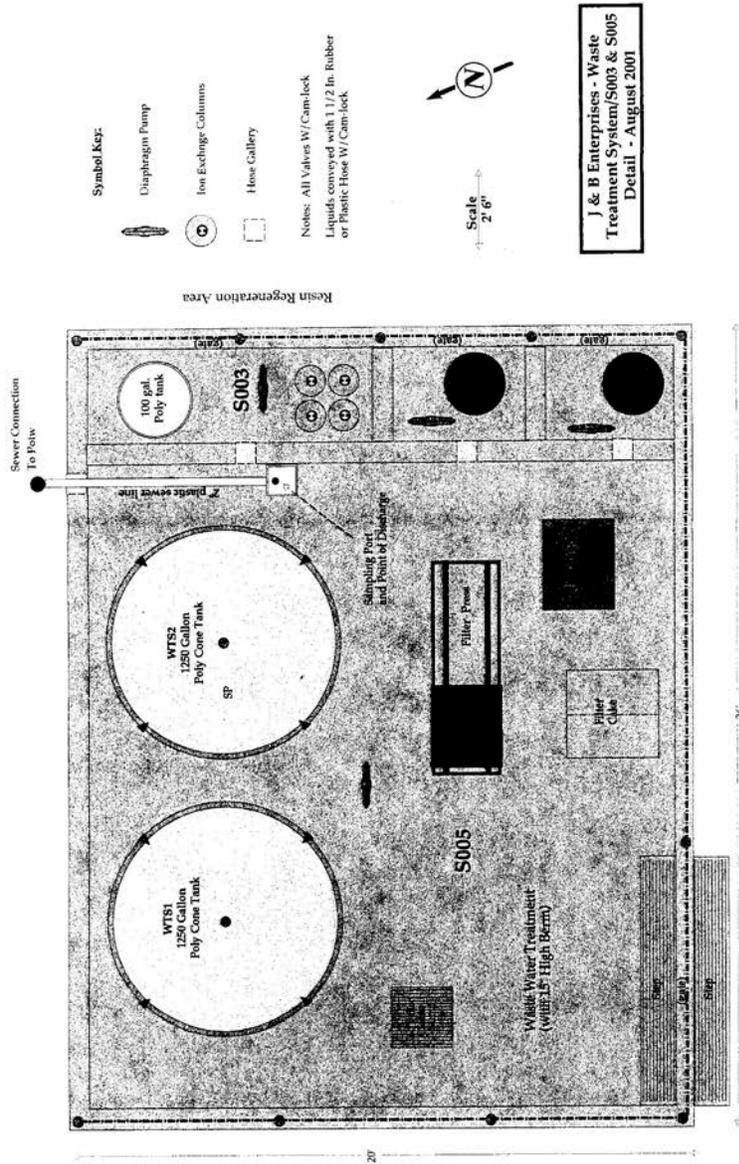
PLAN VIEW OF WASTEWATER TREATMENT SYSTEM
